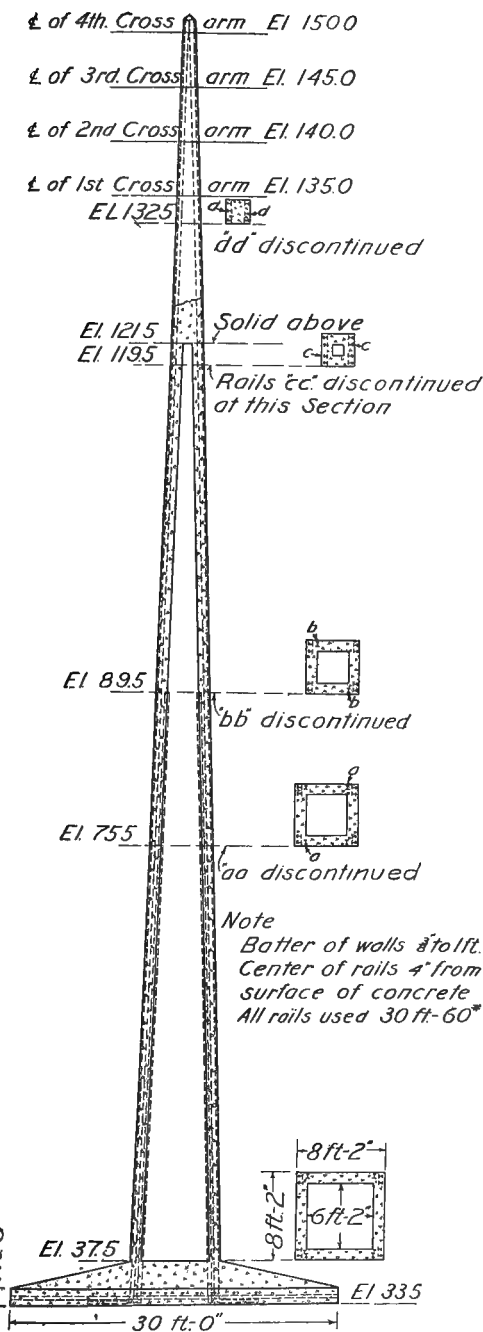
DETAILS OF CONSTRUCTION, BROWNSVILLE TRANSMISSION TOWERS.
